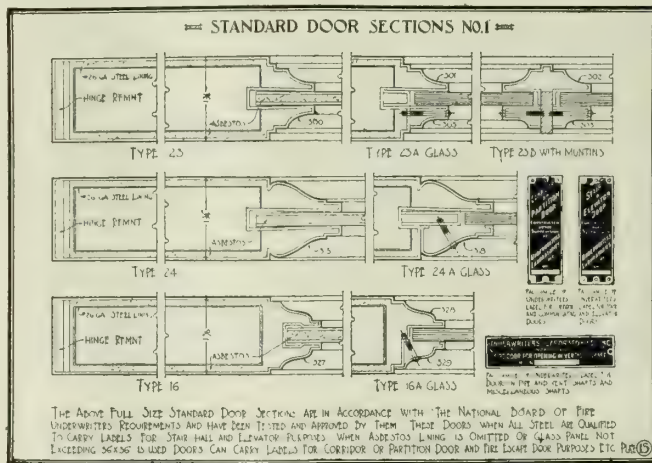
SECTIONAL DETAILS SHOWING TYPICAL DOOR CONSTRUCTION
